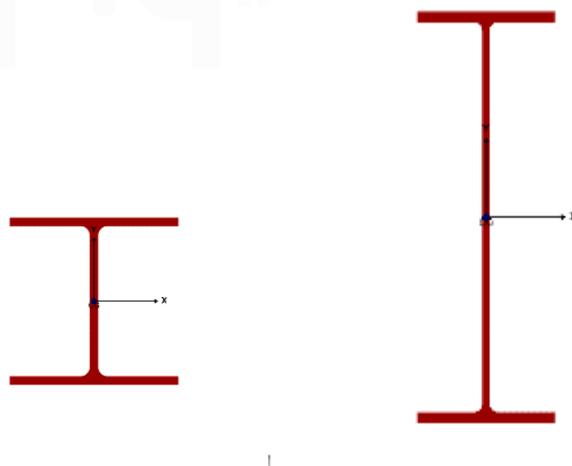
Cross sections of the I rolled column (left) and through plate girder (right)
